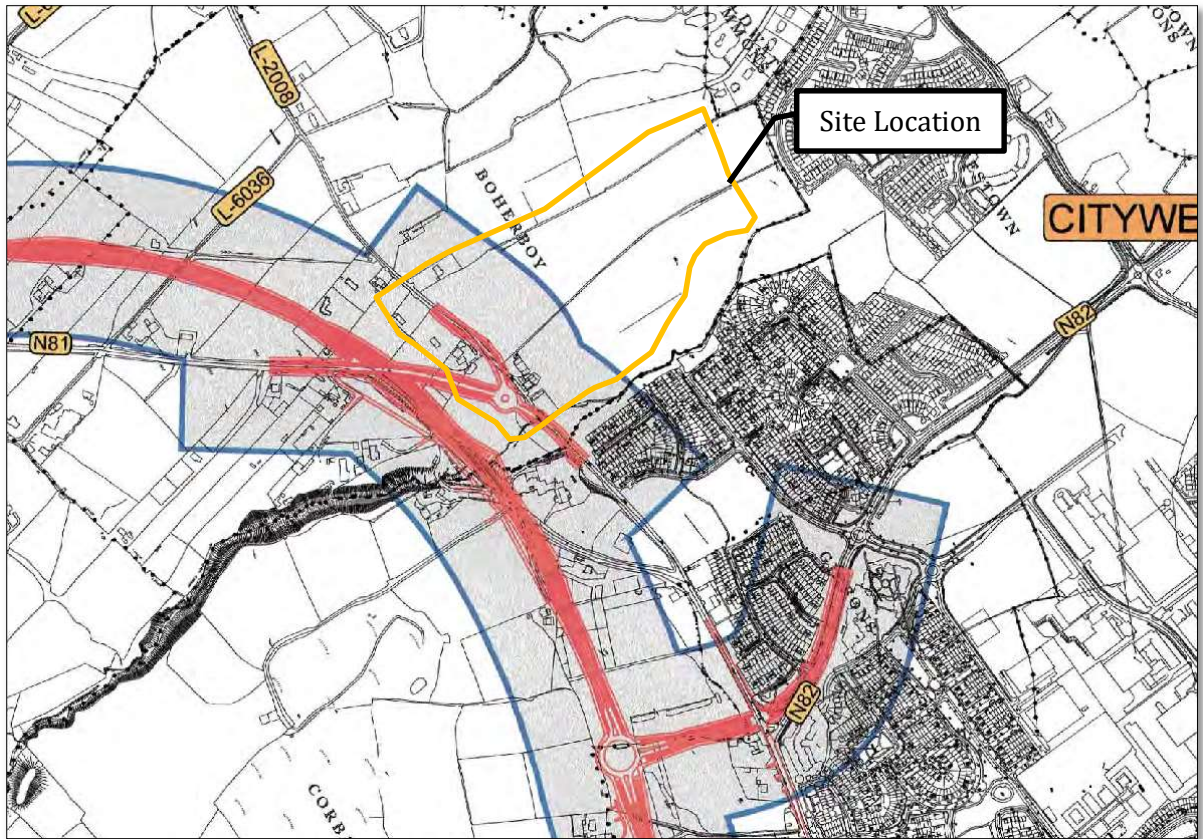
Hollywood Cross to Tallaght Road Improvement Scheme Extract
